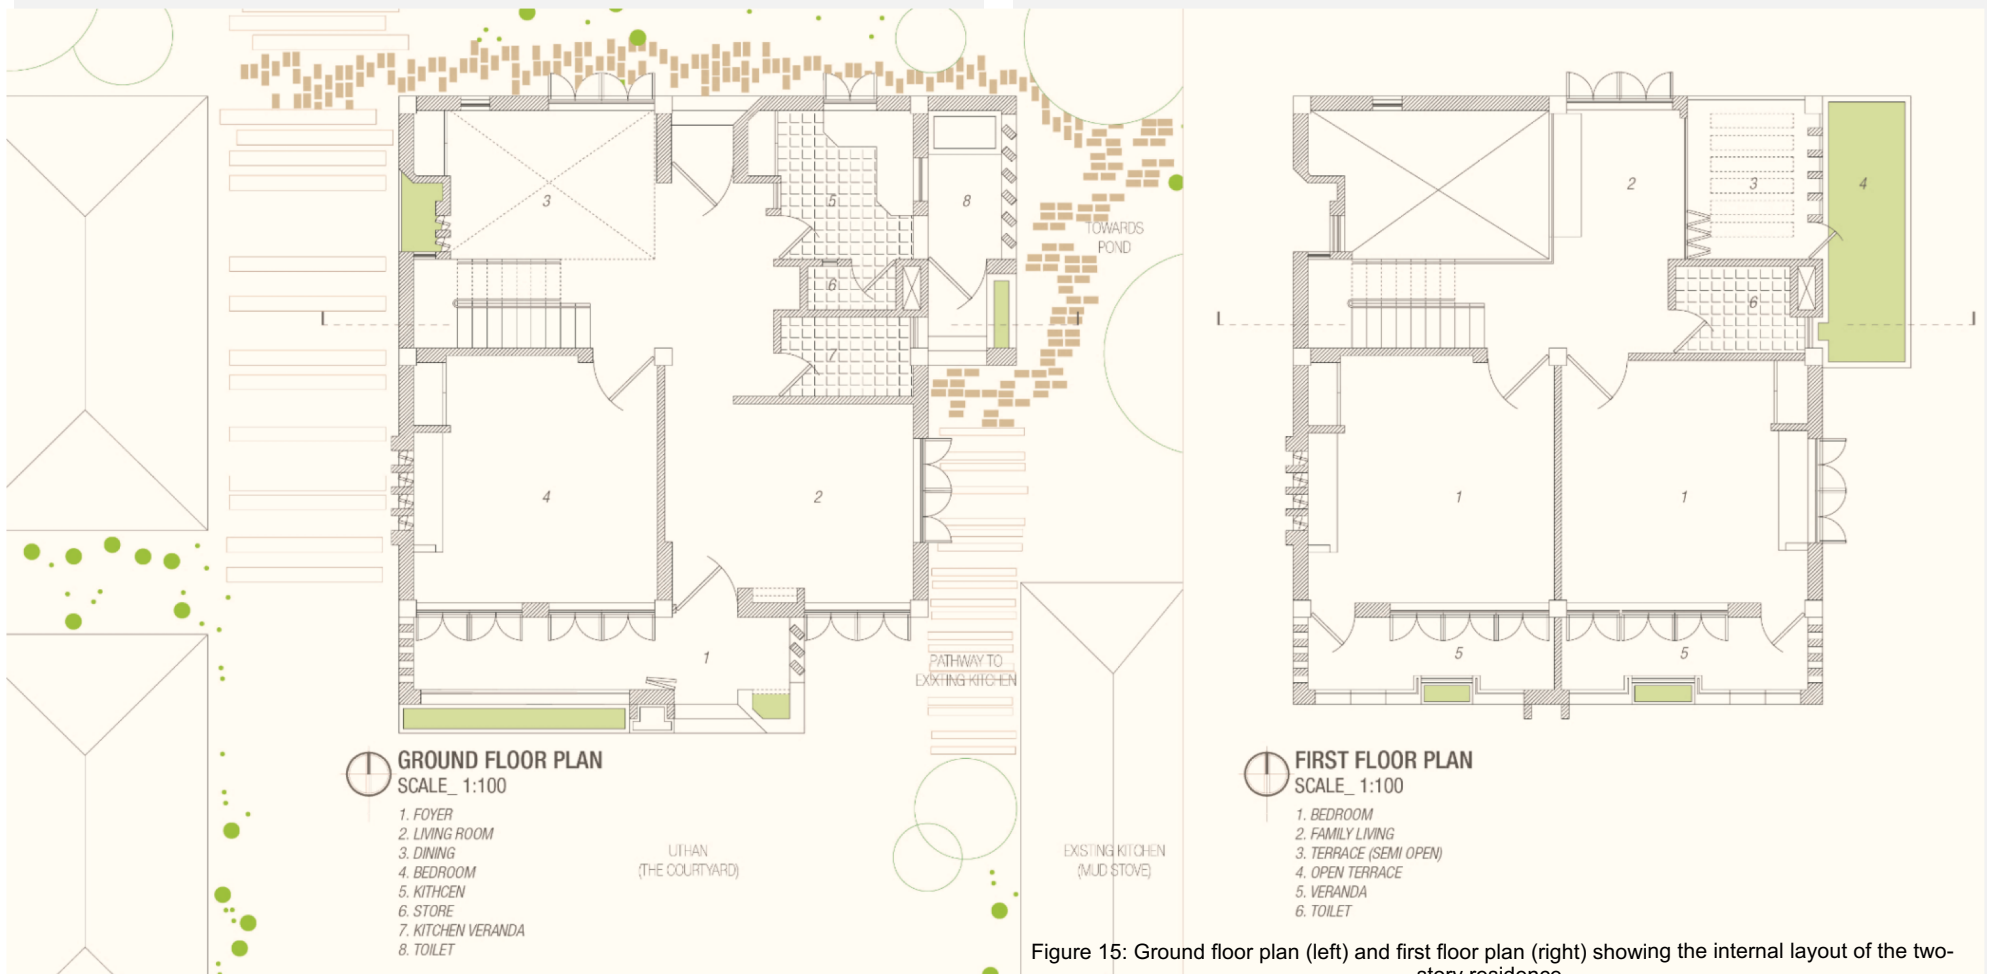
Ground floor plan (left) and first floor plan (right) showing the internal layout of the two-story residence.
